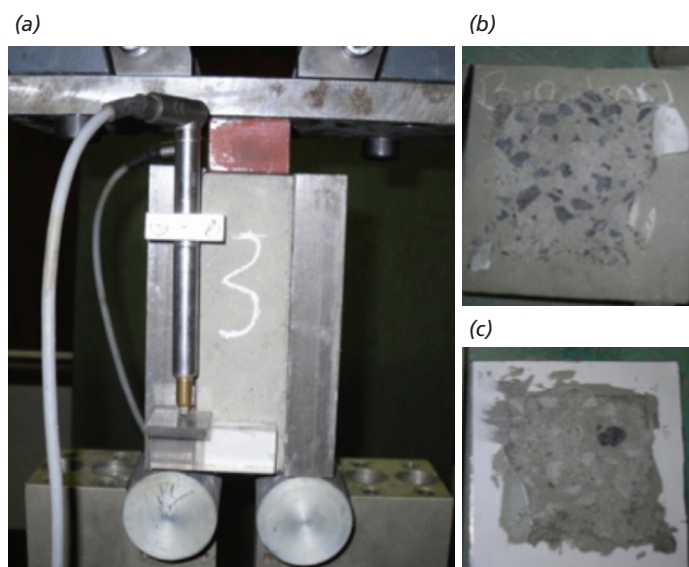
Triplet test (a) setup in Zwick MTM, showing the (b) debonded concrete face and (c) steel plate after the test
